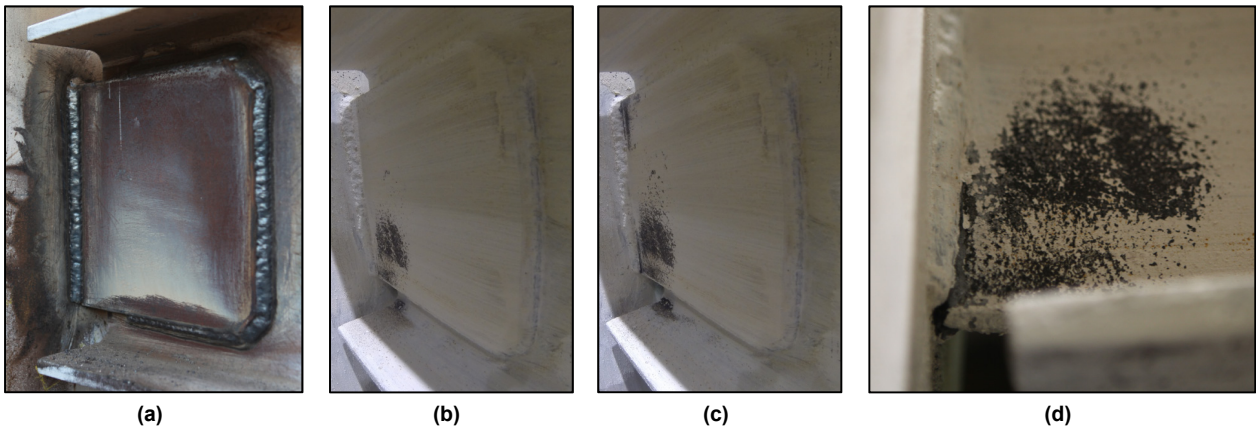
Damage sequence of first-floor east shear tab (welded repair): (a) after initial weld repair (part of 2014-10-25 repair); (b) gross section yielding of shear tab plate (+1.5% drift ratio, second cycle); (c) crack formation at top and bottom of shear tab near column weld line (-1.5% drift ratio, second cycle); and (d) close up of defective weld.
